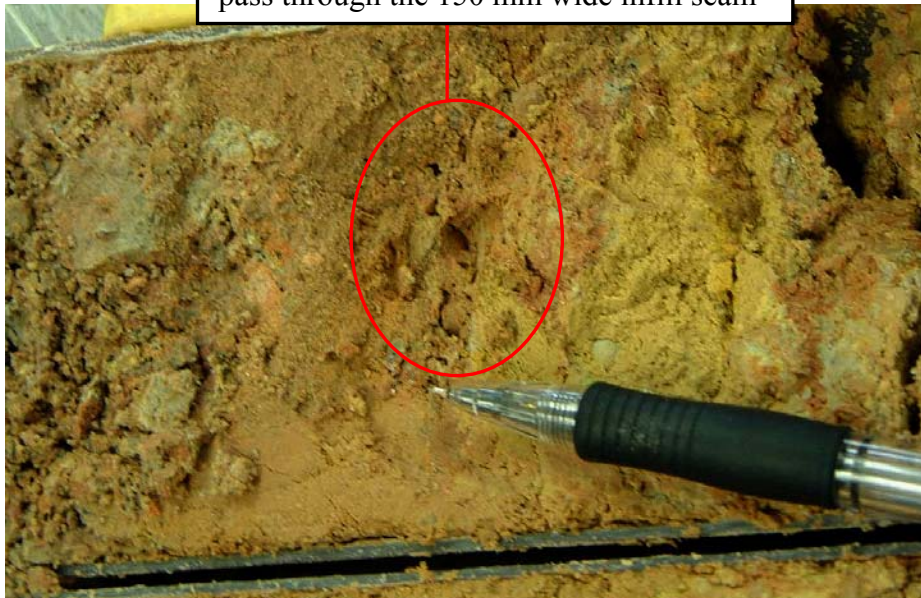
View of 150 mm Infill Seam in Drillhole BH2 at a Depth of 5.9 m
